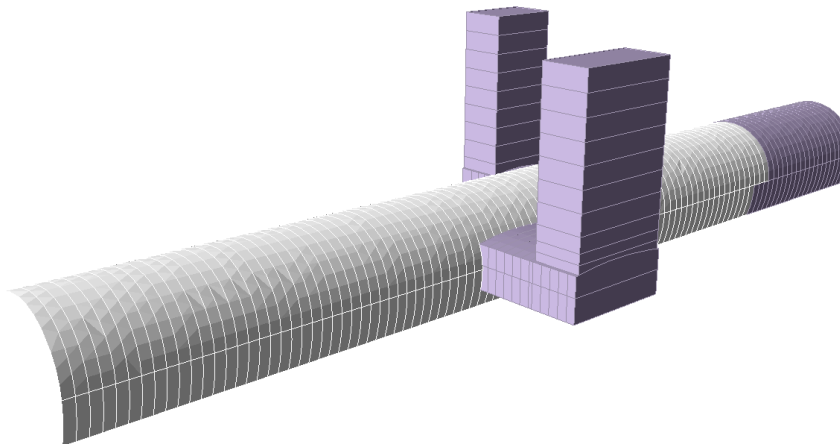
Example of the top heading & bench excavation for the metro tunnel
